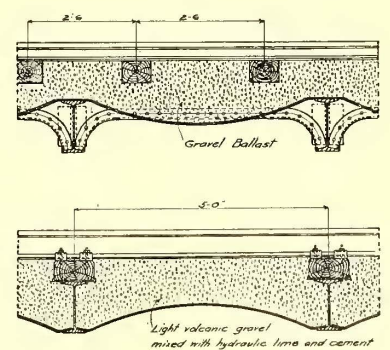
is a side elevation and plan of a typical loop span, comprising latticed deck, longitudinal trusses, semi-latticed girders and riveted posts; and Fig. 10 shows an enlarged transverse section with detail of floor.
